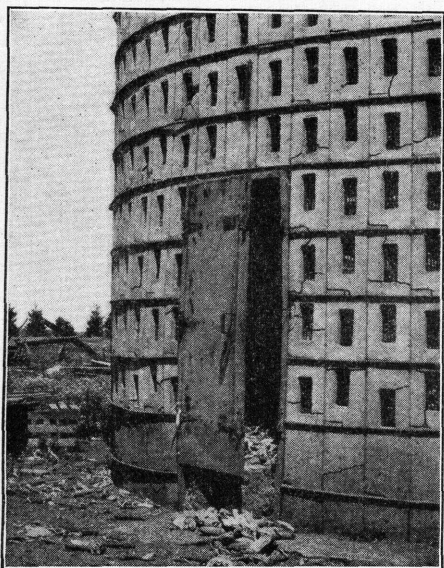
Early type concrete crib of interlocking staves. Poorly designed door frame and poor foundation caused failure shown by cracked staves
